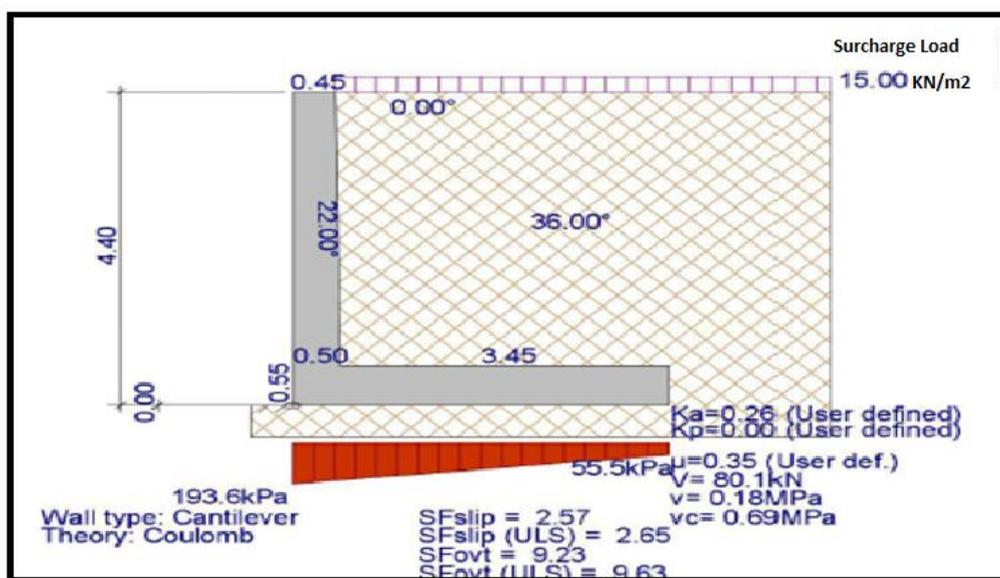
The General Design of the proposed reinforced concrete retaining wall (from station 0+540 to station 0+690) using PROKON software
